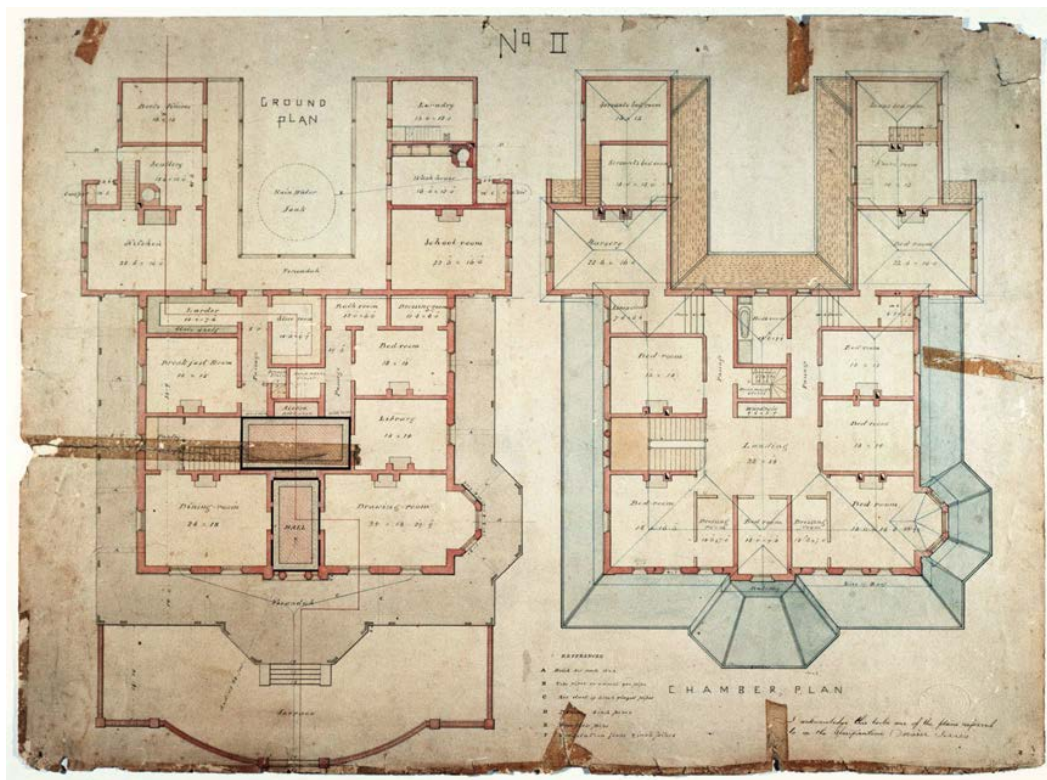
Logan Brae floor plan by Edward Gell, architect.
